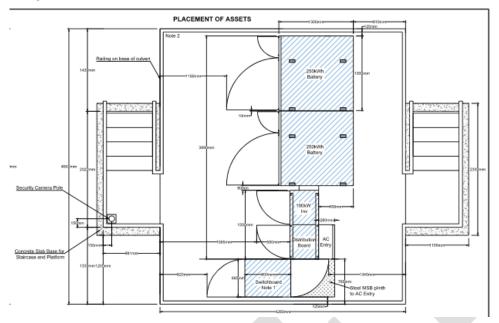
Current Plan - Placement of the Battery system on the Culverts
